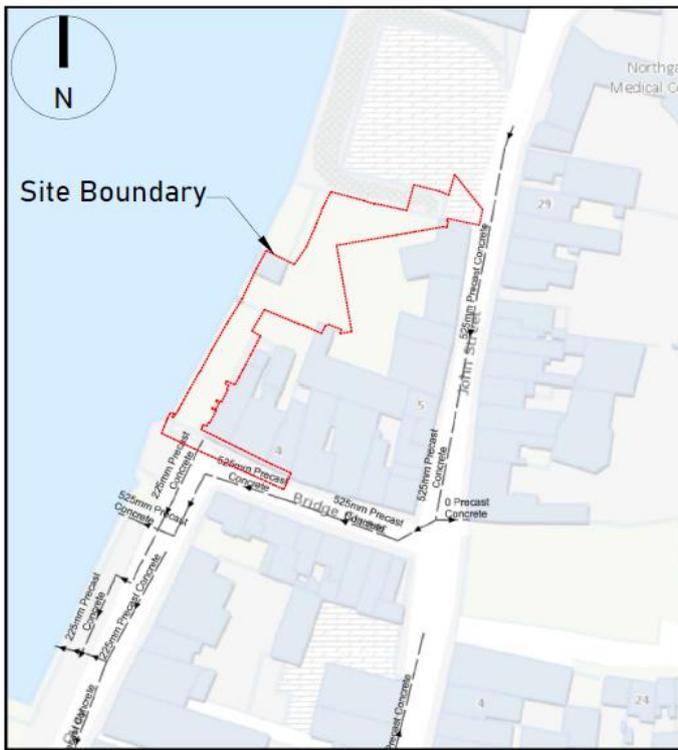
Public Surface Water Sewer Record extract (Source: Brunner Consulting Engineers)
